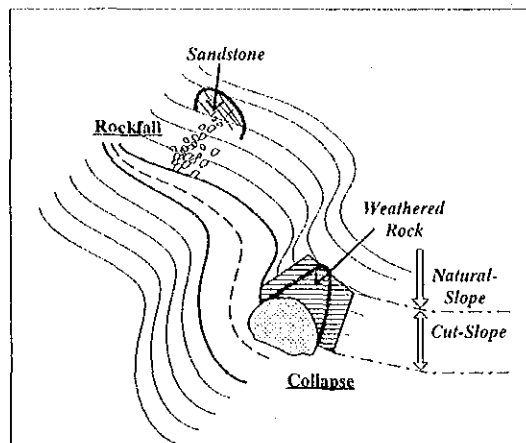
Schematic View of Rock Fall and Collapse
